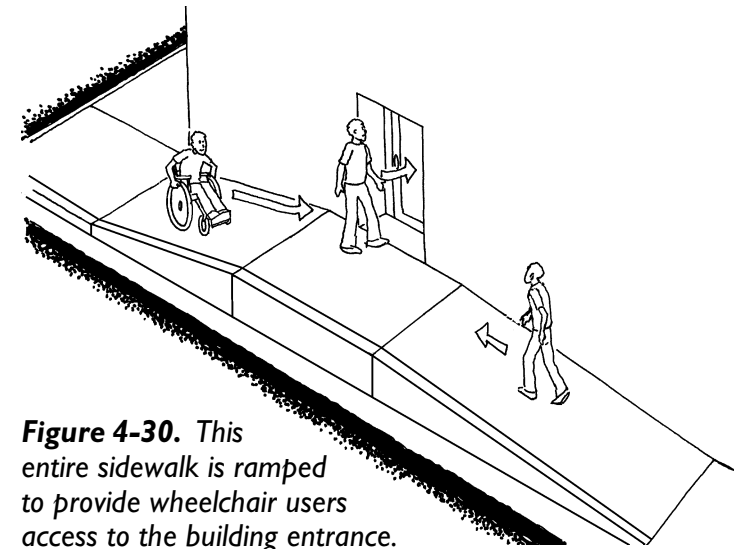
This entire sidewalk is ramped to provide wheelchair users access to the building entrance.
